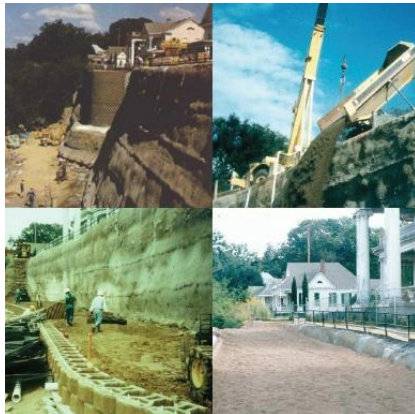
ESCS LWA Backfill behind Segmental Retaining Wall, Bluff Restoration, Natchez, Mississippi [2]
